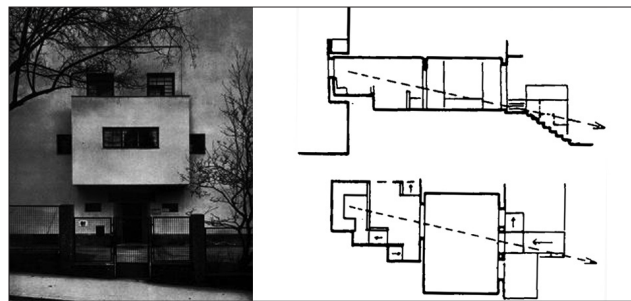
Façade; Section & Plan of the Moller House (A. Loos)
